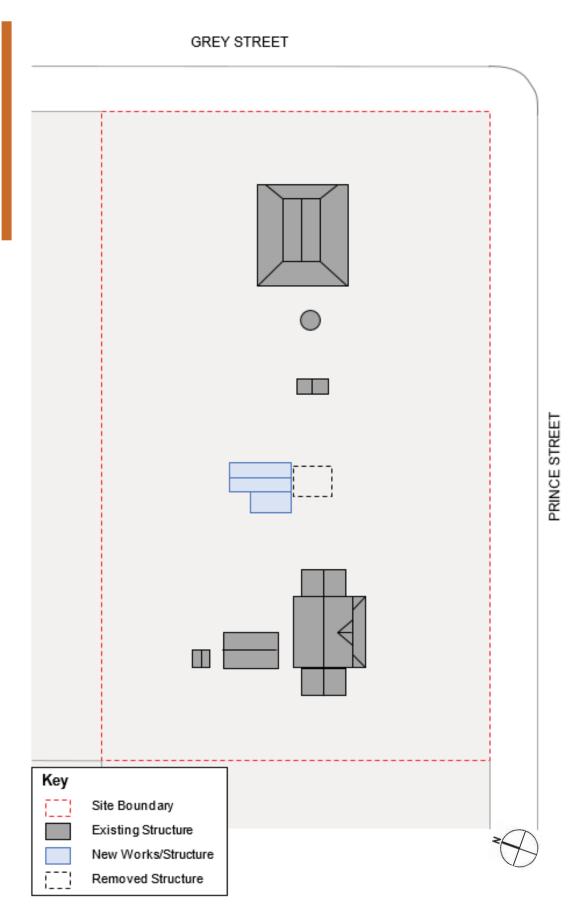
Clarence Town Courthouse and site period of construction - 1964
